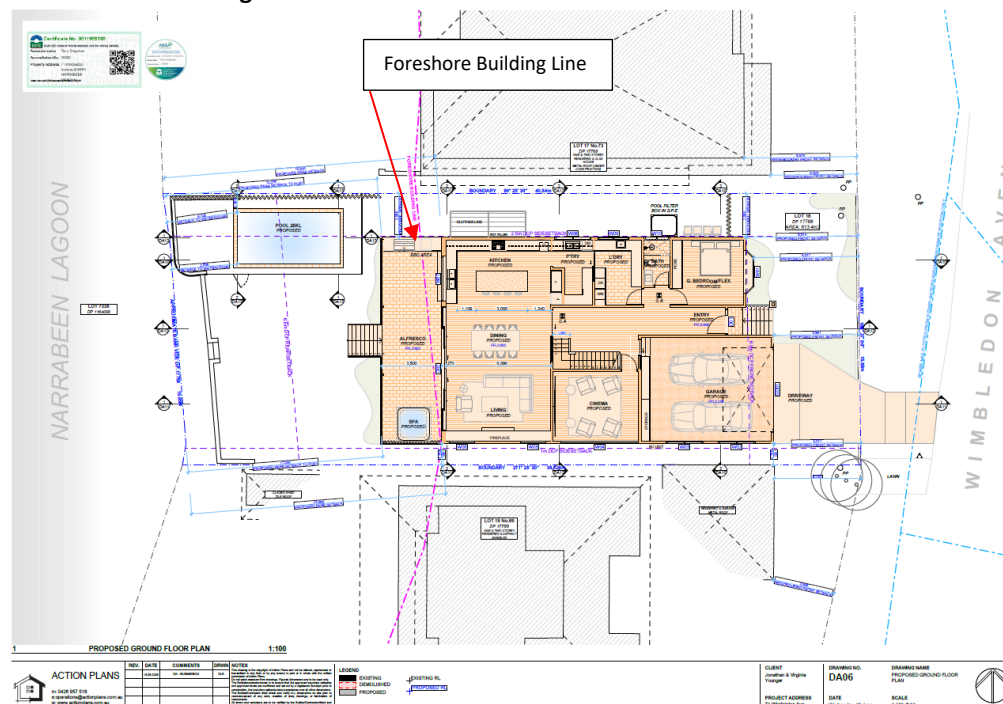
Plan Extract: Proposed Dwelling, illustrating the proposed encroachment of deck into the foreshore building line.
